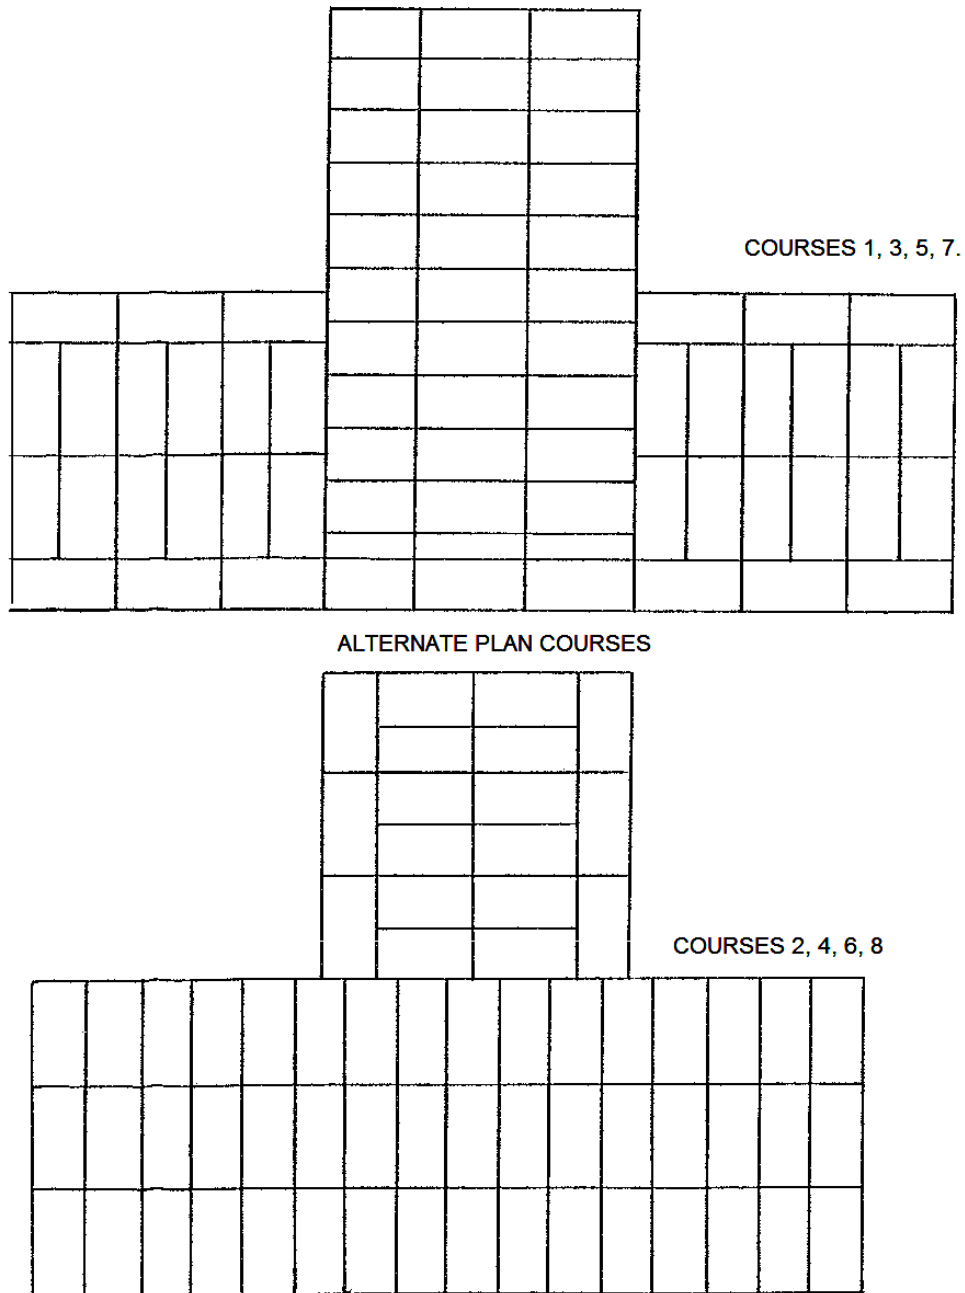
The alternate plan courses of a stopped intersection between two three-brick walls laid in English bond
